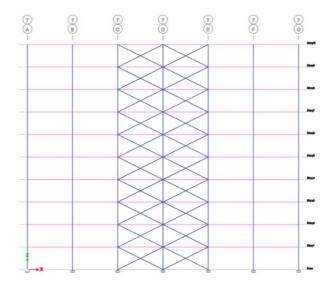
Flat slab with bracing having(G+10) story building (Plan View)
